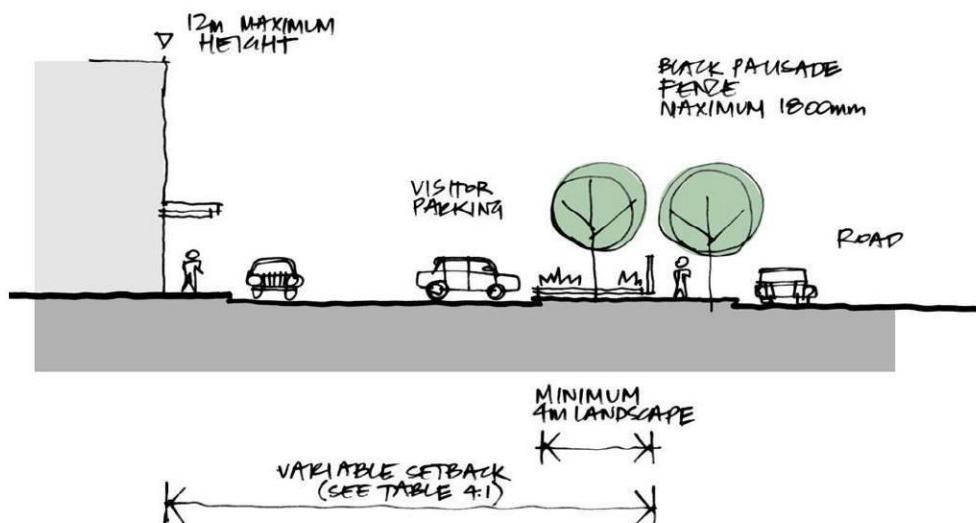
Illustration of Building Setbacks - Smaller Site (Cross Section)
